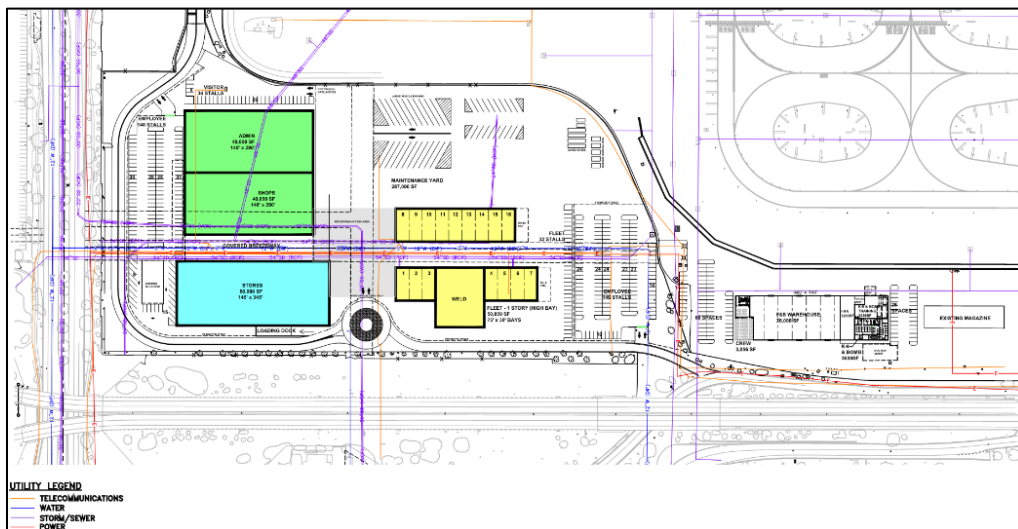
shows Scheme 3 for the F&S Tonto Campus Scheme 3 shows the Admin and Shops building as a single story with the Admin section on the north and the Shops section connected to it on the south. Its location falls slightly within the arrival Runway Protection Zone (RPZ). The proposed Admin and Shops building's parking area is located west of the building and accessed via the north side of the site off the realigned Tonto Street. The visitor parking area for the Admin building is located on the north side of the building and is also accessed via the north side of the site. The proposed Stores building is located south of the Admin and Shops building and is connected to the Admin and Shops building by a covered breezeway. The proposed parking area for the Stores building is located west of the building and is accessed at the same location as the parking for the Admin and Shops building. The Stores building has a proposed loading dock on the south side of the building which is accessed via the south side of the side off the realigned Tonto Street. The proposed Fleet building is located east of the Stores building. The Fleet building is divided into two structures with 7 of the bays and the Weld area location on the south and the remaining 9 bays located just north. The parking area for the Fleet building is located east of the Fleet building and south of the proposed Maintenance Yard and is accessed via the south side of the site off the realigned Tonto Street.
